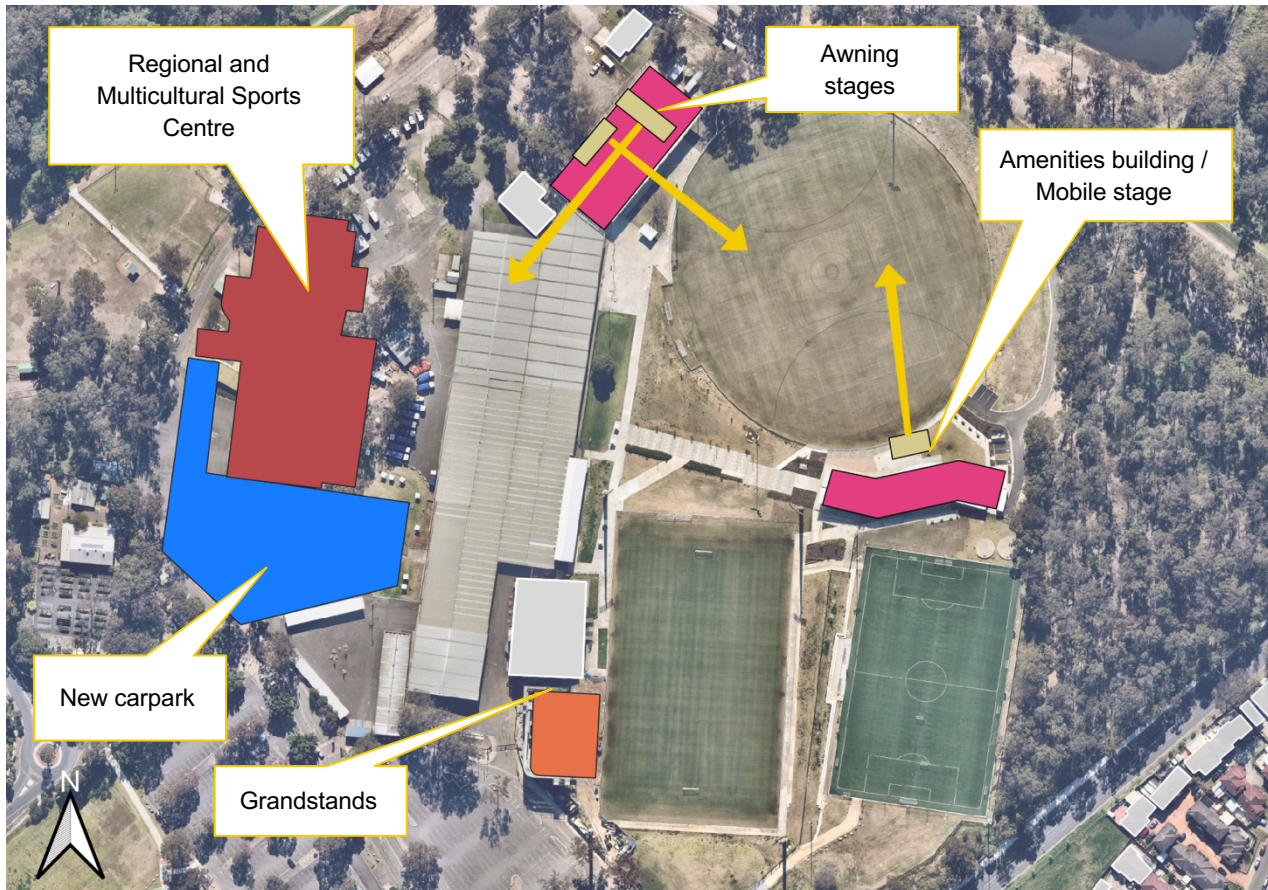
Fairfield Showground redevelopment site layout and stage directions
